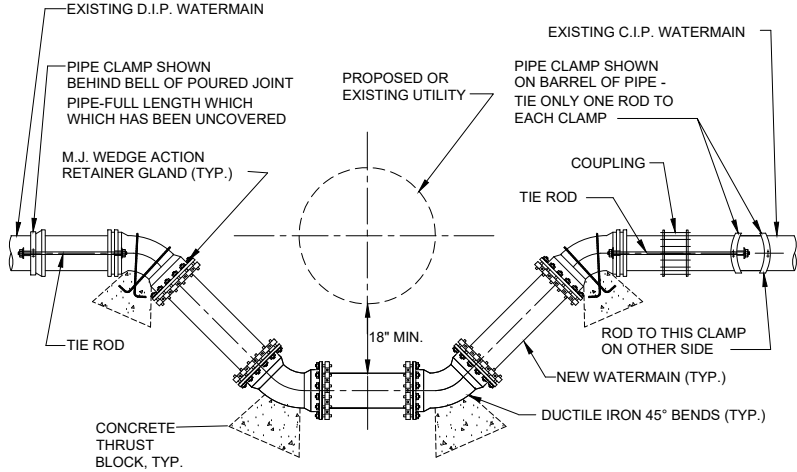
DETAIL OF TIE-ROD AT MECHANICAL JOINT
